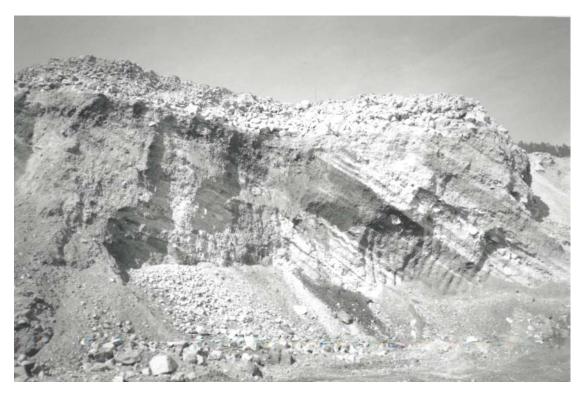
Dipping, layered structure visible on an excavated section of the waste rock dump.
